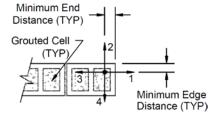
ILLUSTRATION OF SCREW-BOLT+ ANCHORS INSTALLED INTO GROUTED CONCRETE MASONRY WALL
